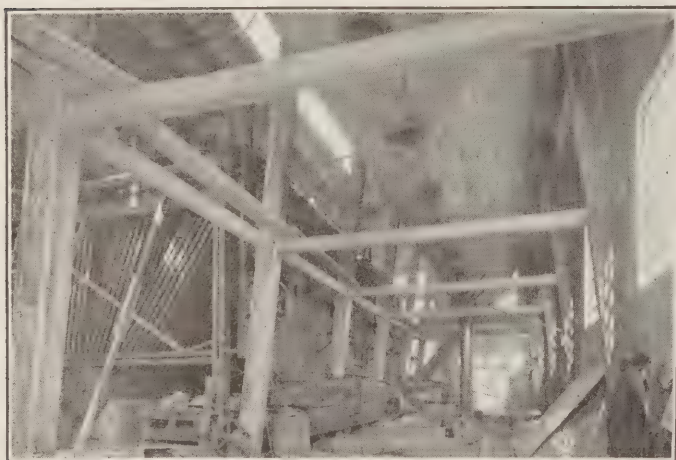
INTERIOR OF BOILER HOUSE, SHOWING CONCRETE COAL BUNKERS
